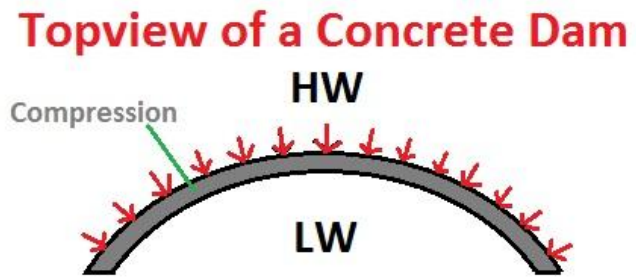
TOPVIEW OF A CONCRETE DAM
